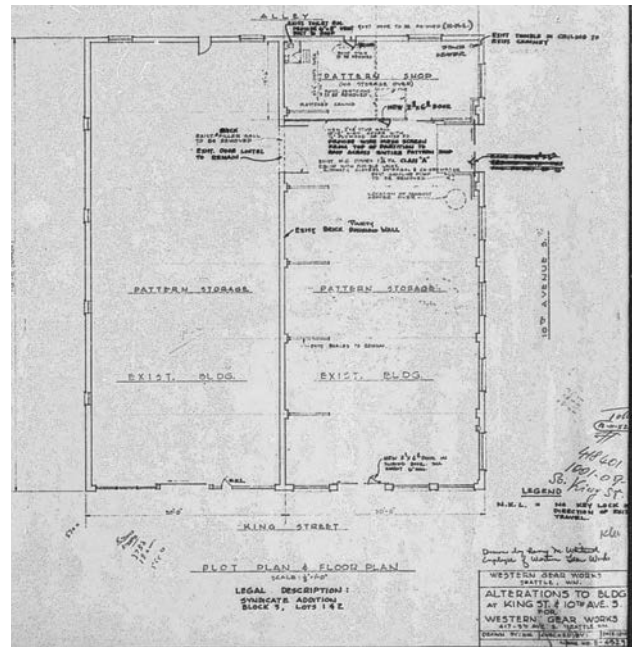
1001-1005 S. King Street pattern Shop plans (dated 12/11/1952)
